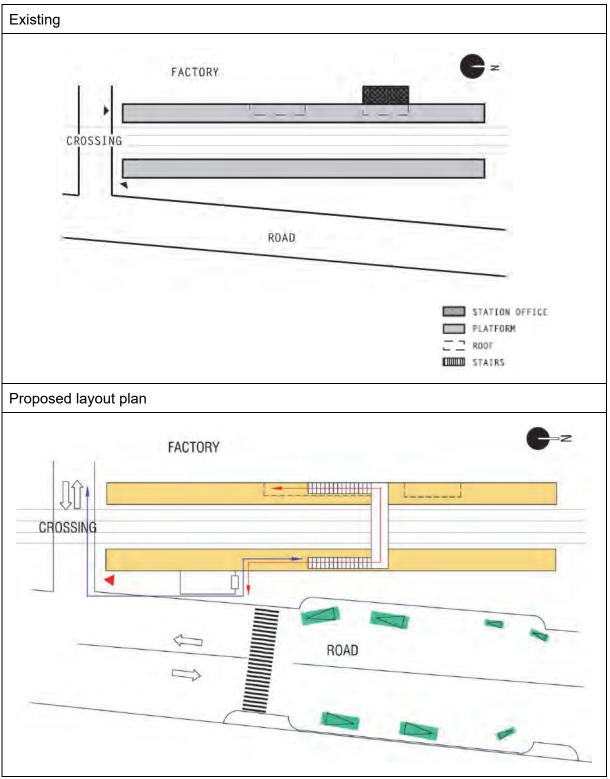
Existing and Proposed Layout Plan (Thamaing Myothit Station)
